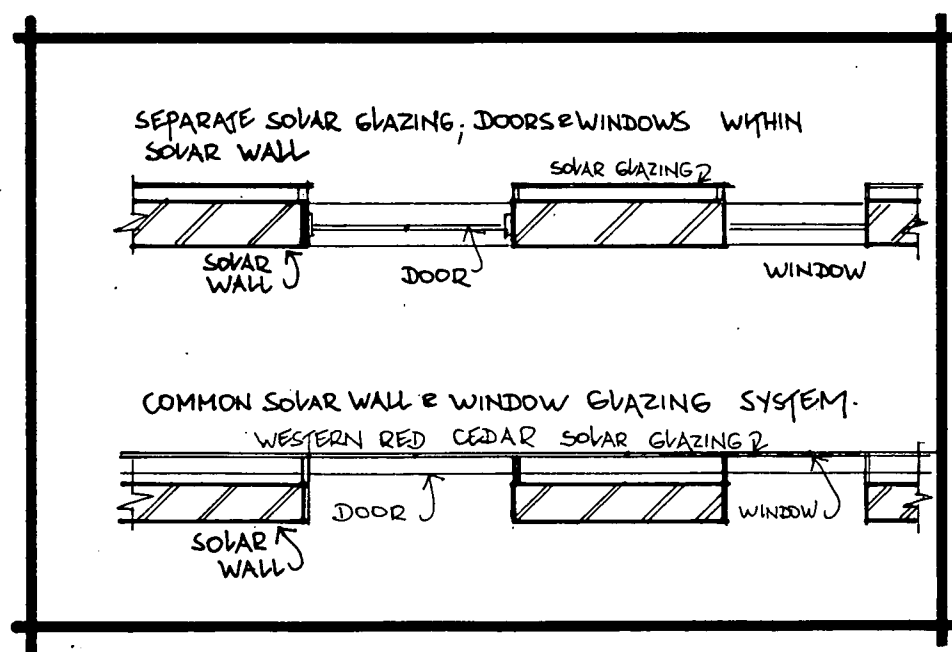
Two different solar wall glazing systems used by the surveyed solar buildings.
